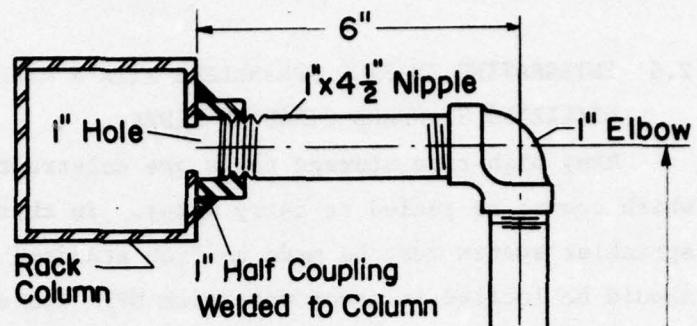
Detail of Face Sprinkler Assembly and Connection to Rack Column.
